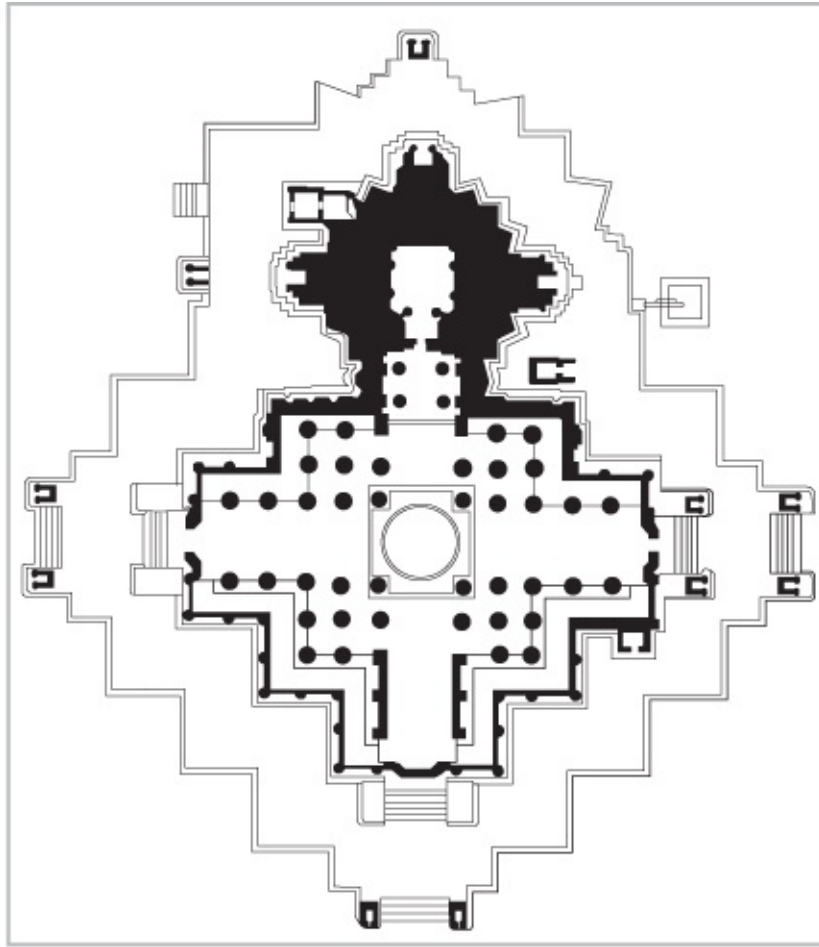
; PLAN OF KESHAHA TEMPLE, BELUR
